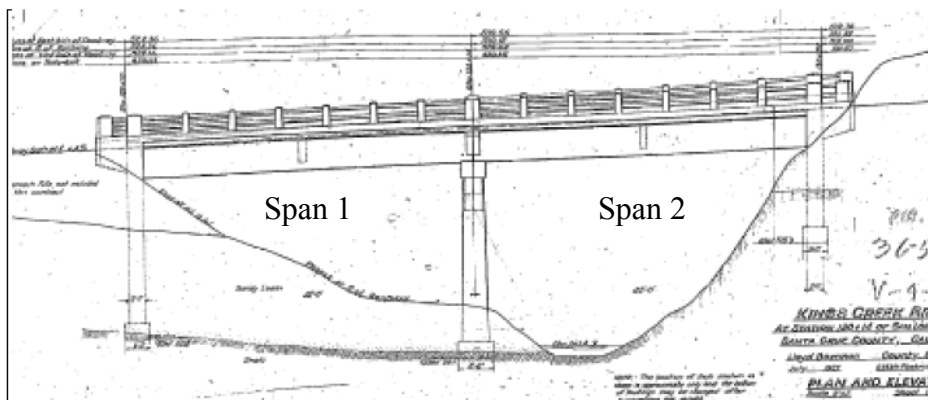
Schematic View of Kings Creek Bridge No.36-0054
